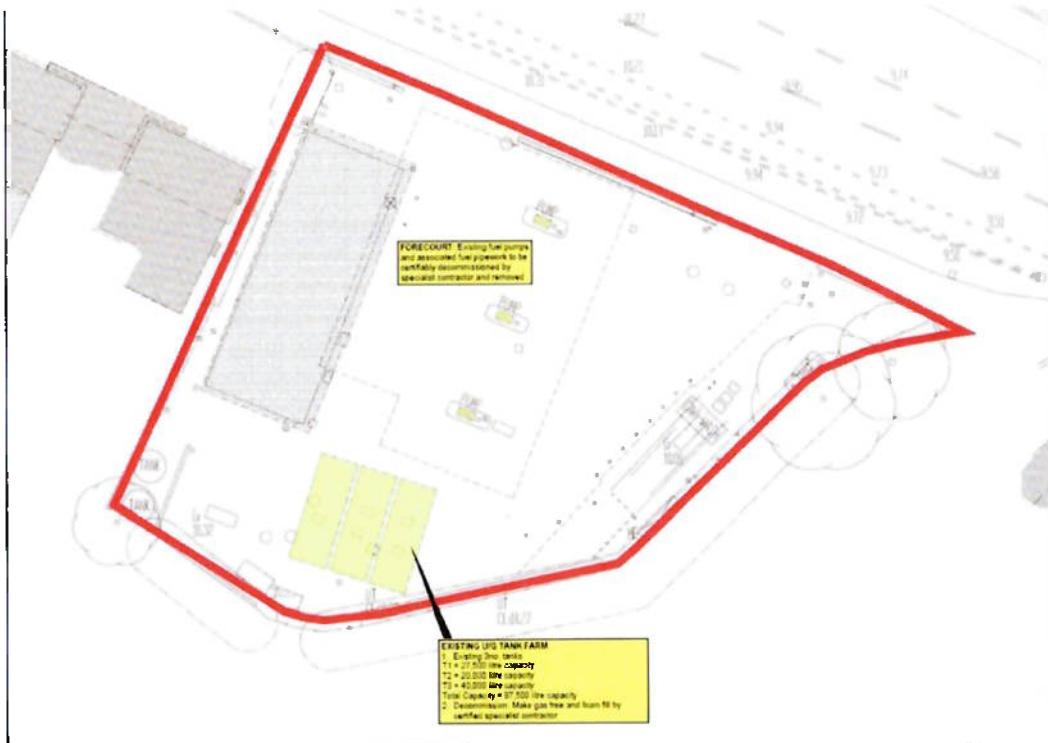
Extract from site layout plan prepared by JA Gorman Consulting Engineers showing location of existing tanks.
